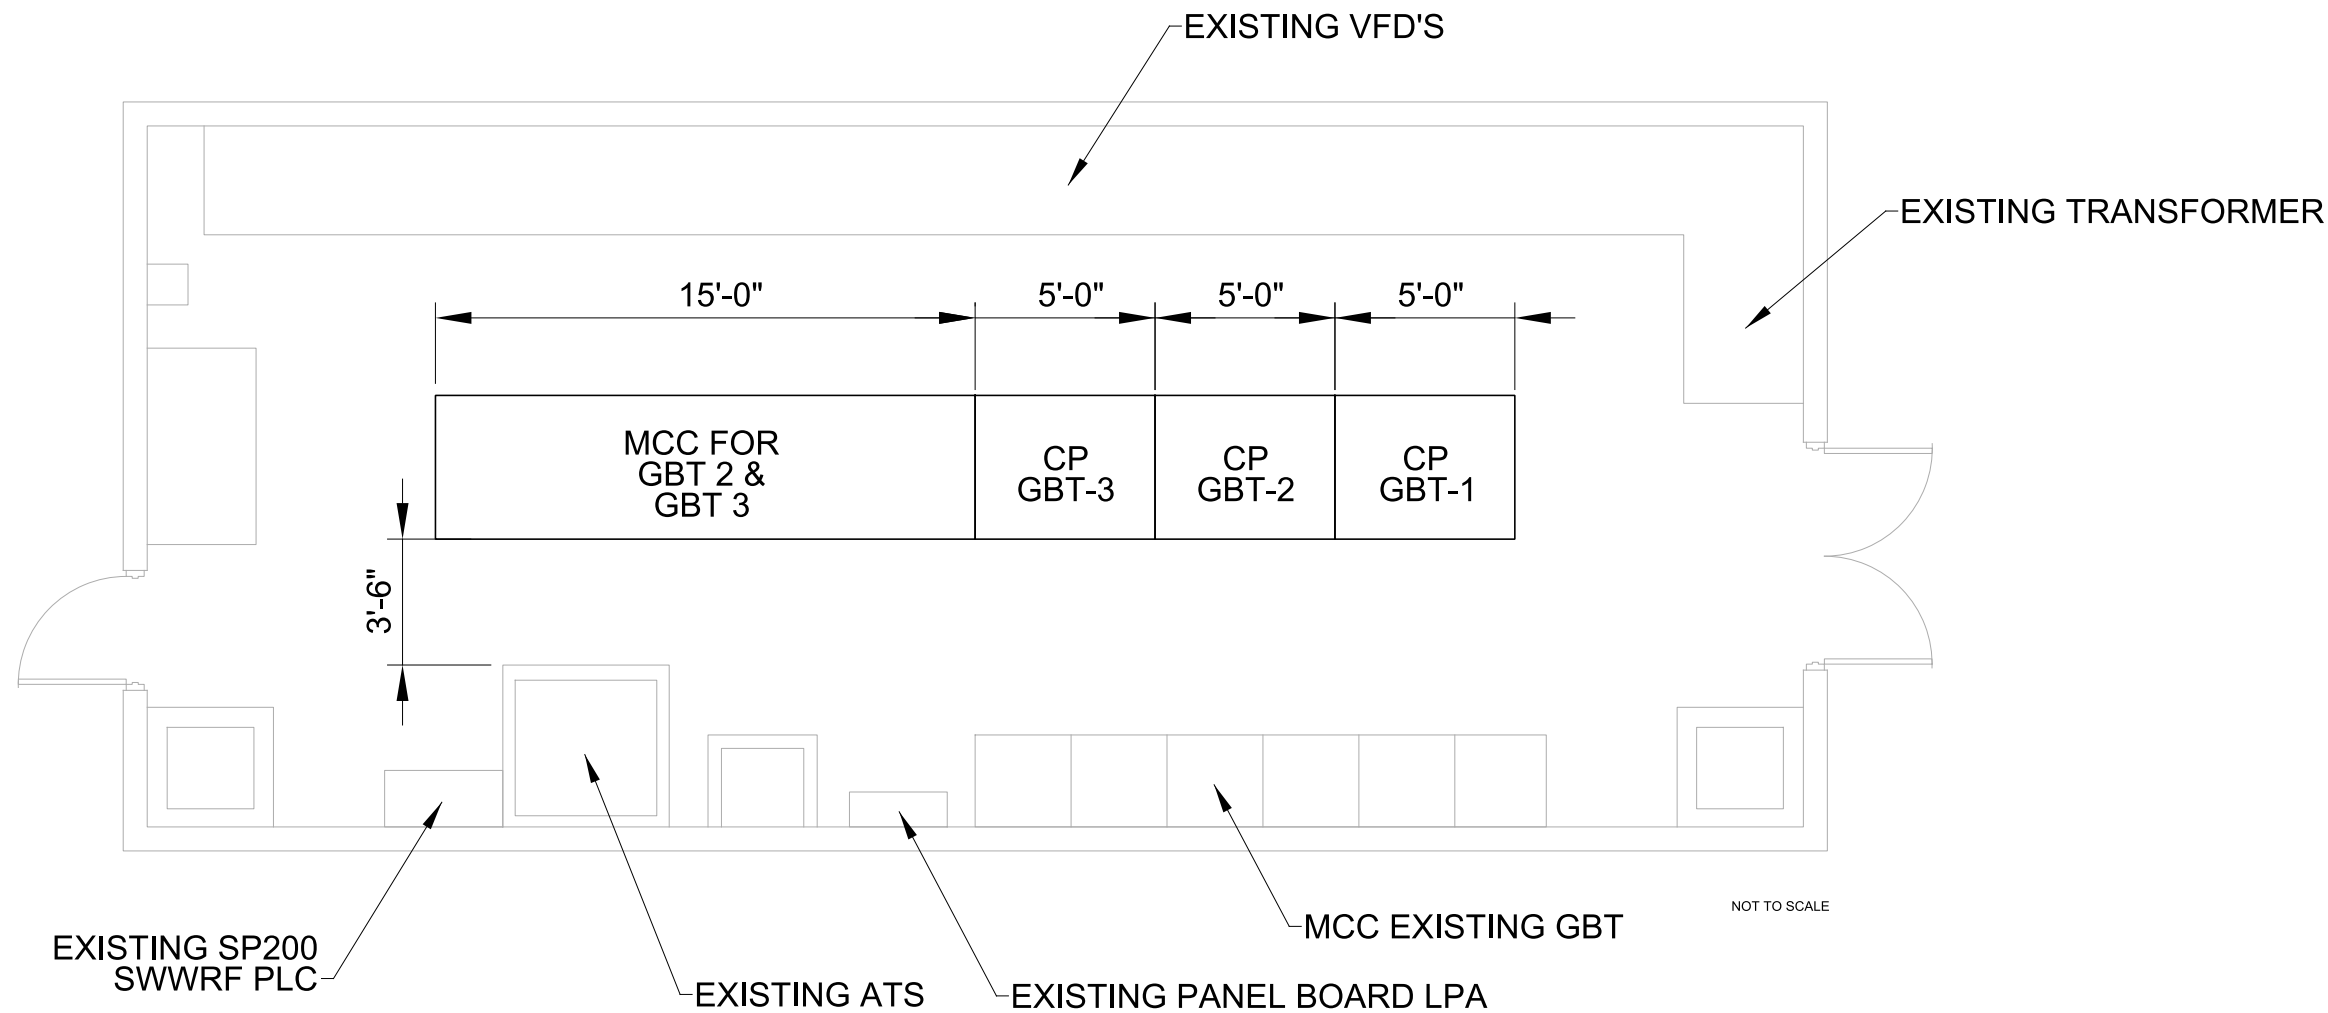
Existing Electrical Building at the SWWRF
